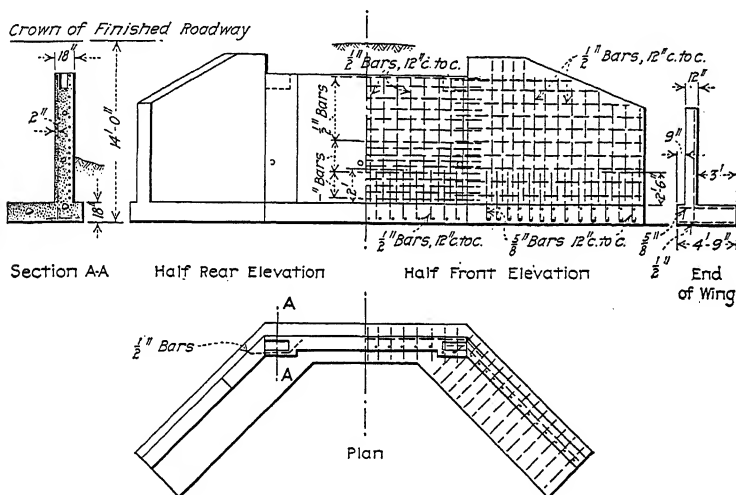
Type of abutment used for girder bridges by the Illinois Highway Commission. Wings of cantilever type. Main wall supported by wings as counterforts.
